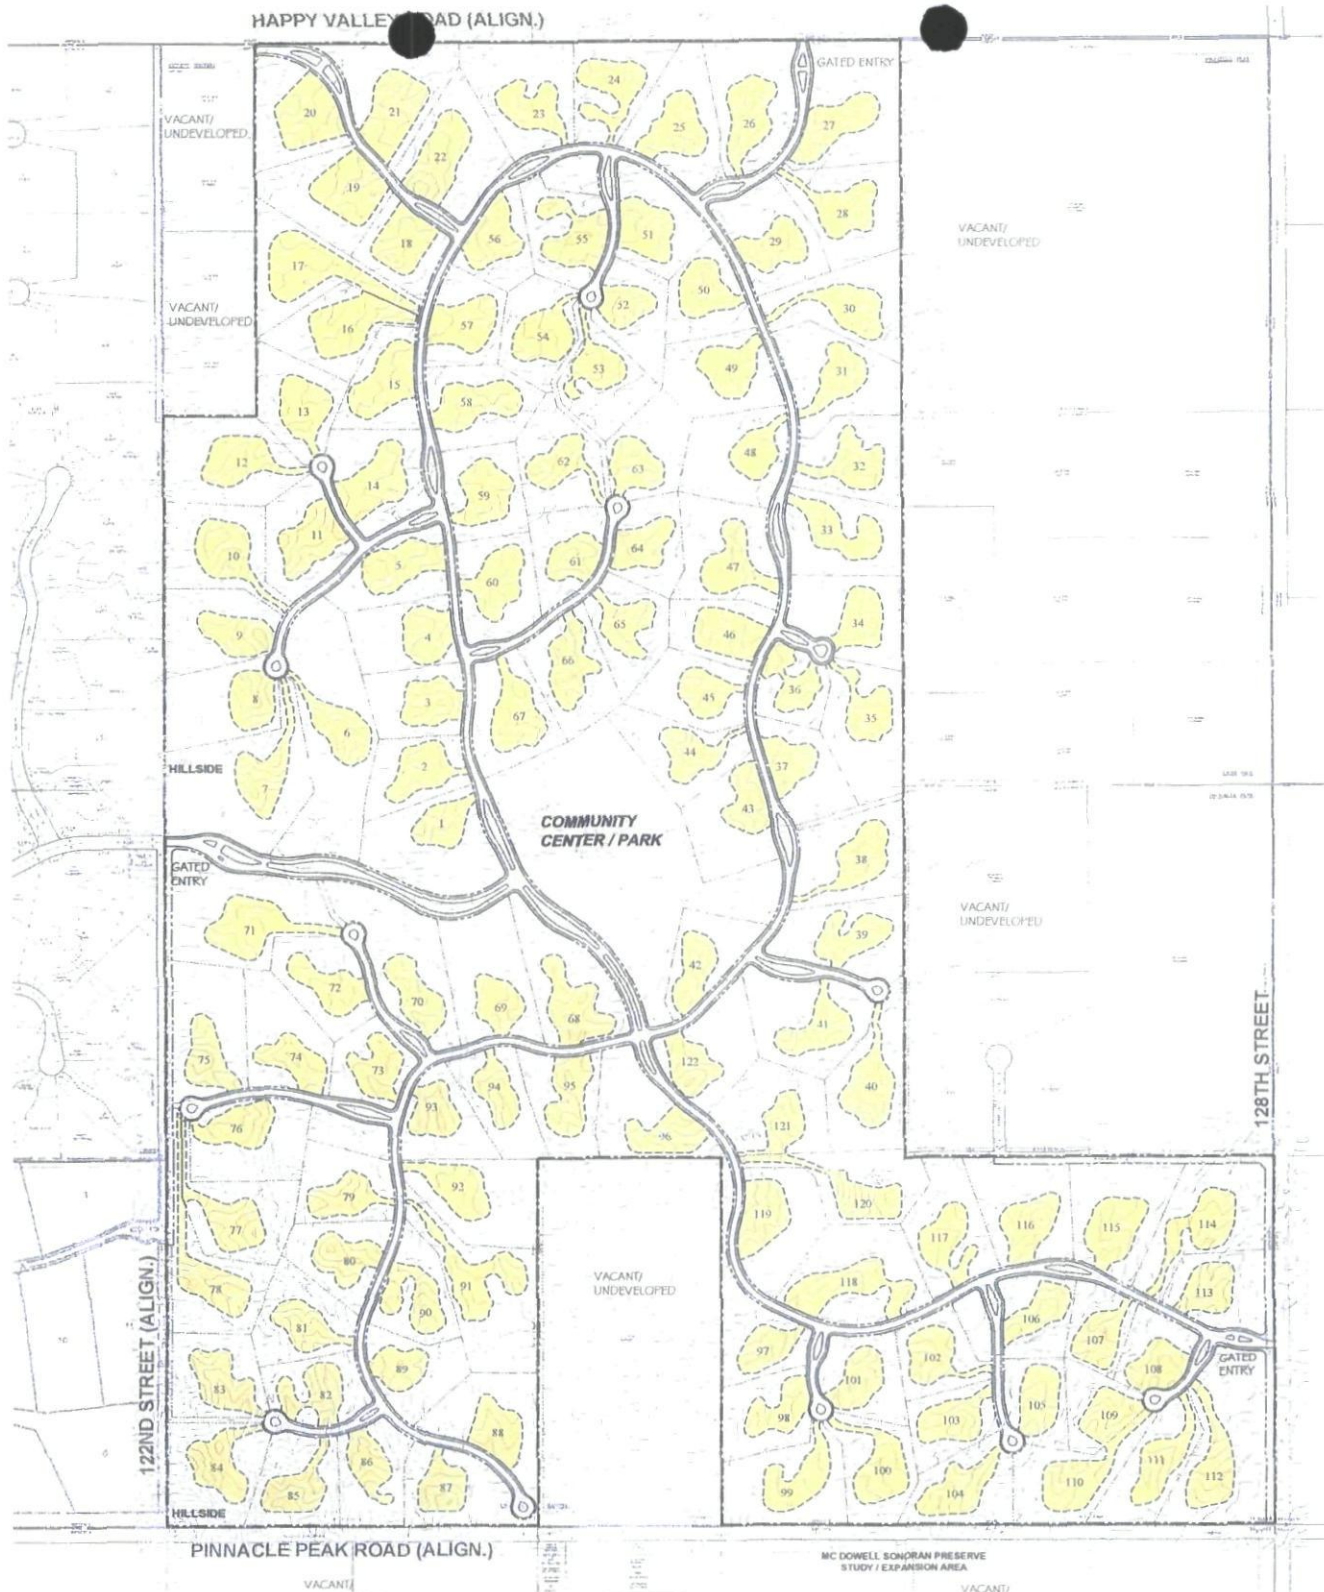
SITE PLAN w/ TOPO OVERLAY
